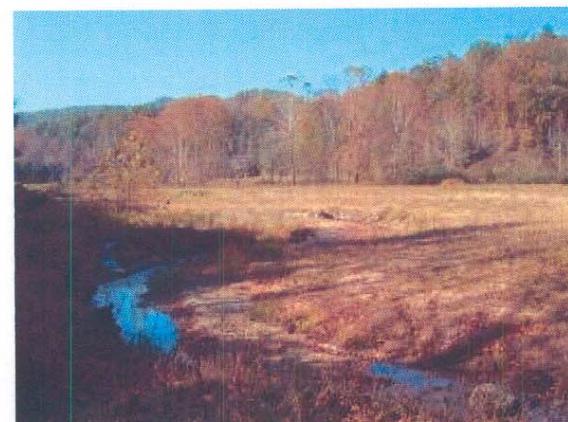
Looking downstream from as-built Station ~17+75.
